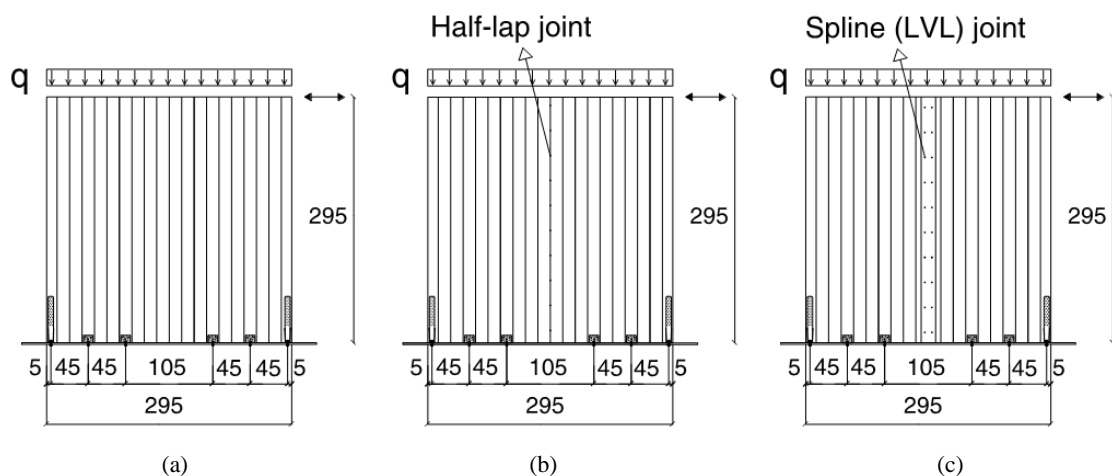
Wall panel test configurations: (a) configuration I - single walls; (b) configuration II - coupled walls with half-lap joint; (c) configuration III - coupled walls with spline (LVL) joint (measures in cm) [37].
